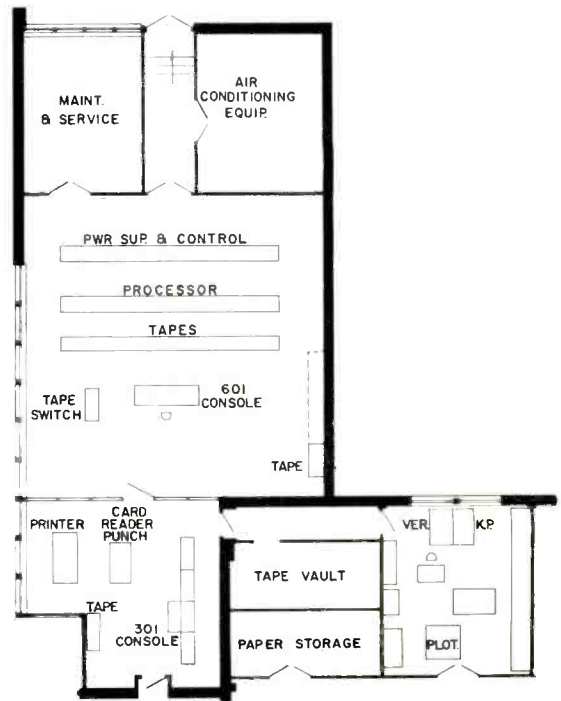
Floor plan of new computer wing which is outlined by heavy line. Two rooms at lower right are part of original building.
